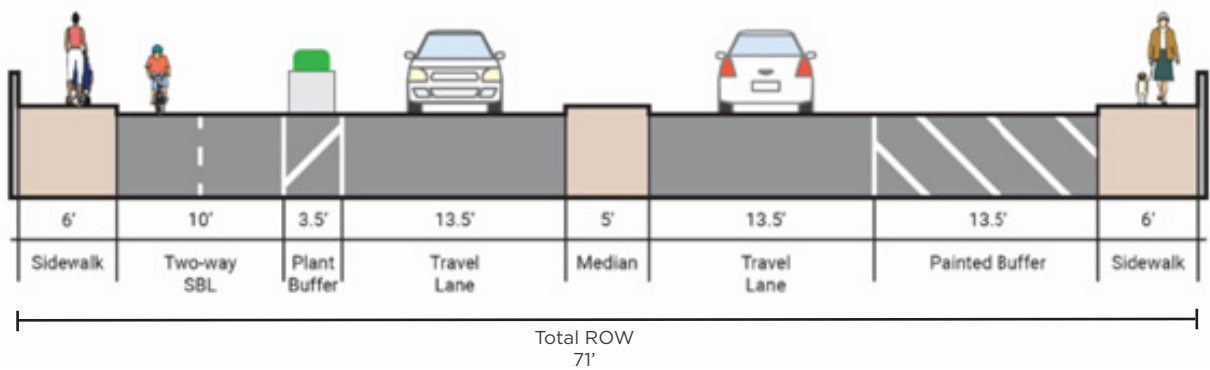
Clifton Boulevard Bridge Section - Short-term (looking eastbound)
